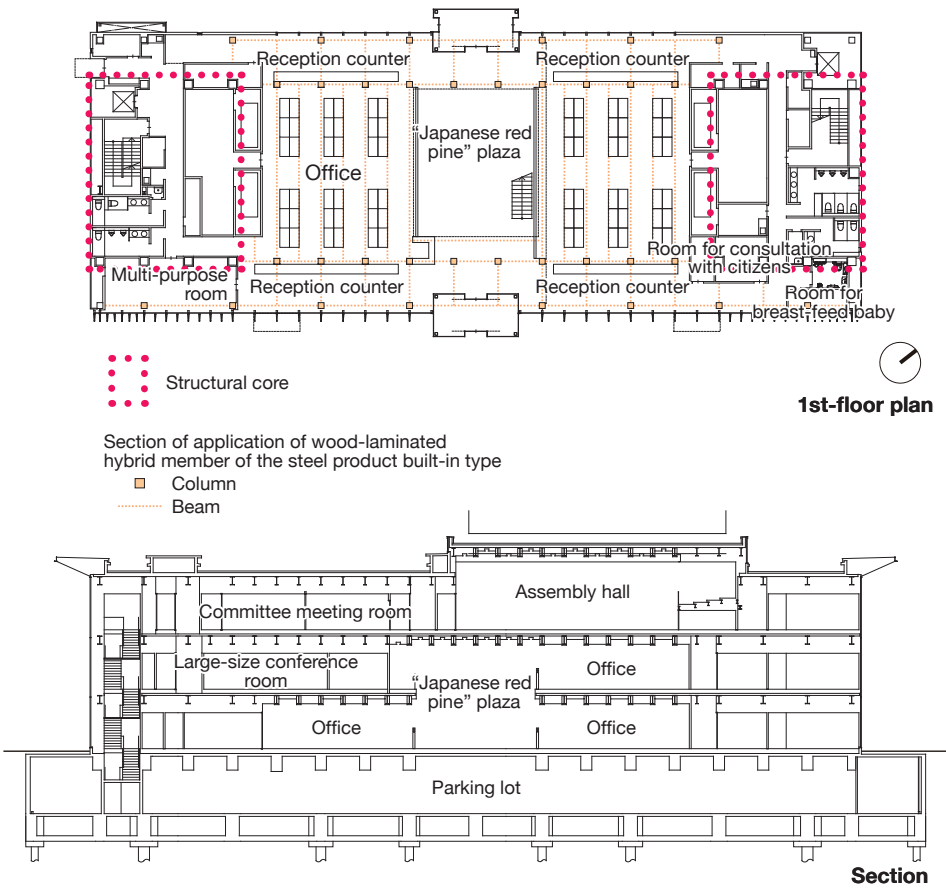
Wood-laminated Hybrid Member of the Steel Product Built-in Type (Column and Beam)
